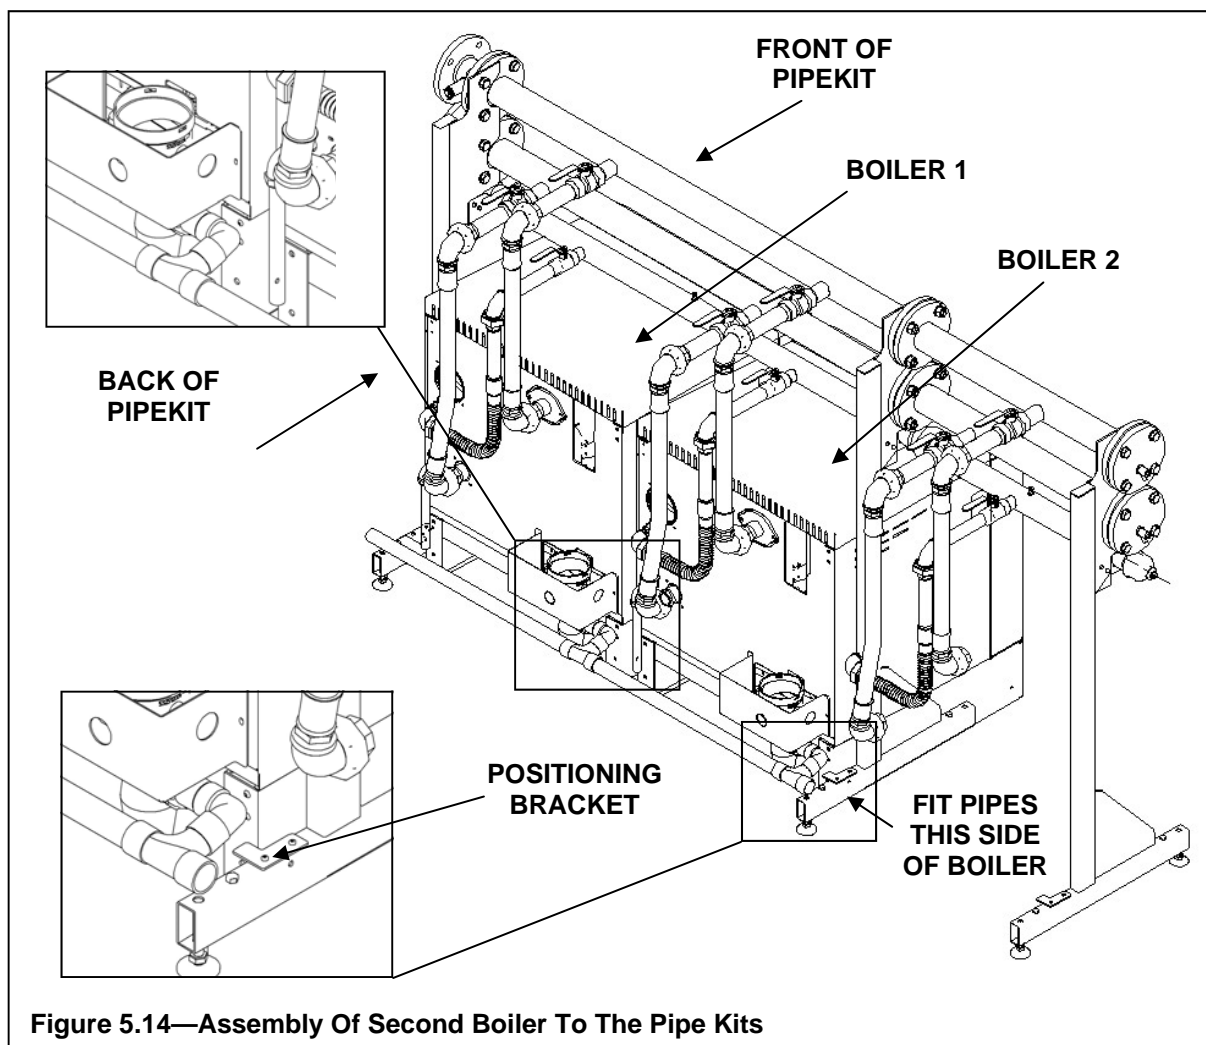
Assembly Of Second Boiler To The Pipe Kits
